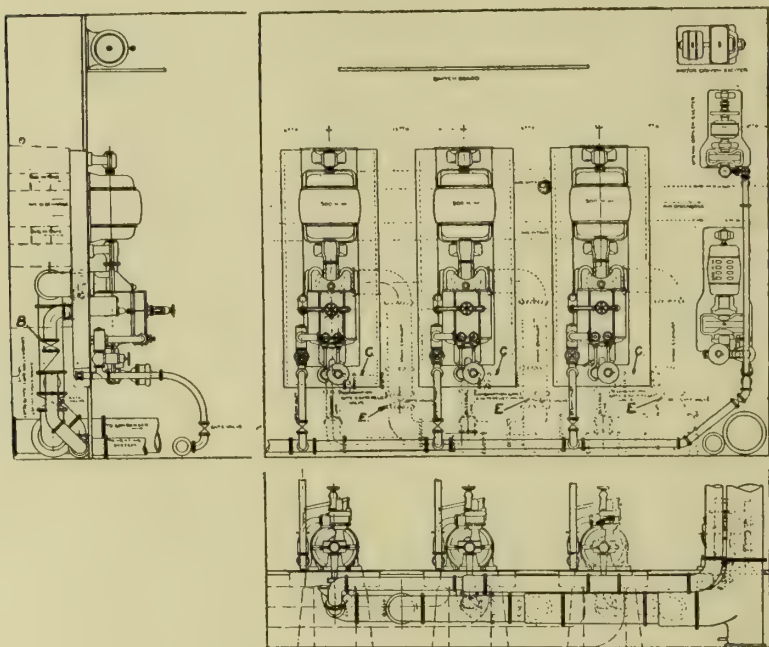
STATION LAY-OUT, WITH BLEEDER TURBINE.
